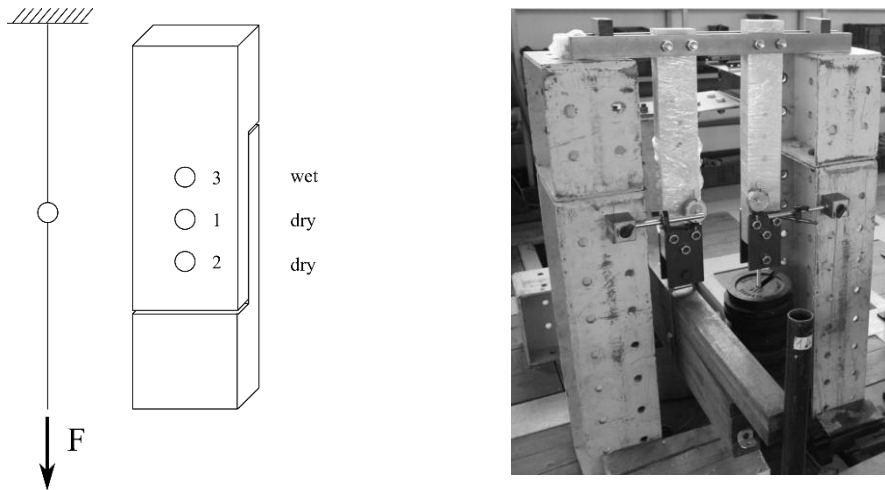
Scheme of the experiment, typical geometry and numbering the dowels (left), the loaded specimens using weight loading (right)
